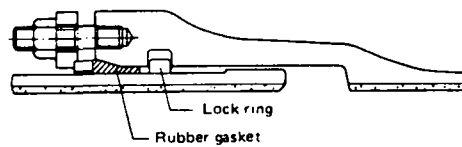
Plan for earthquake-proof joint' (chain type joint)
